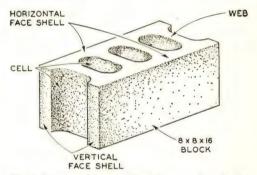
Concrete Masonry Unit Showing Face Shells and Webs
